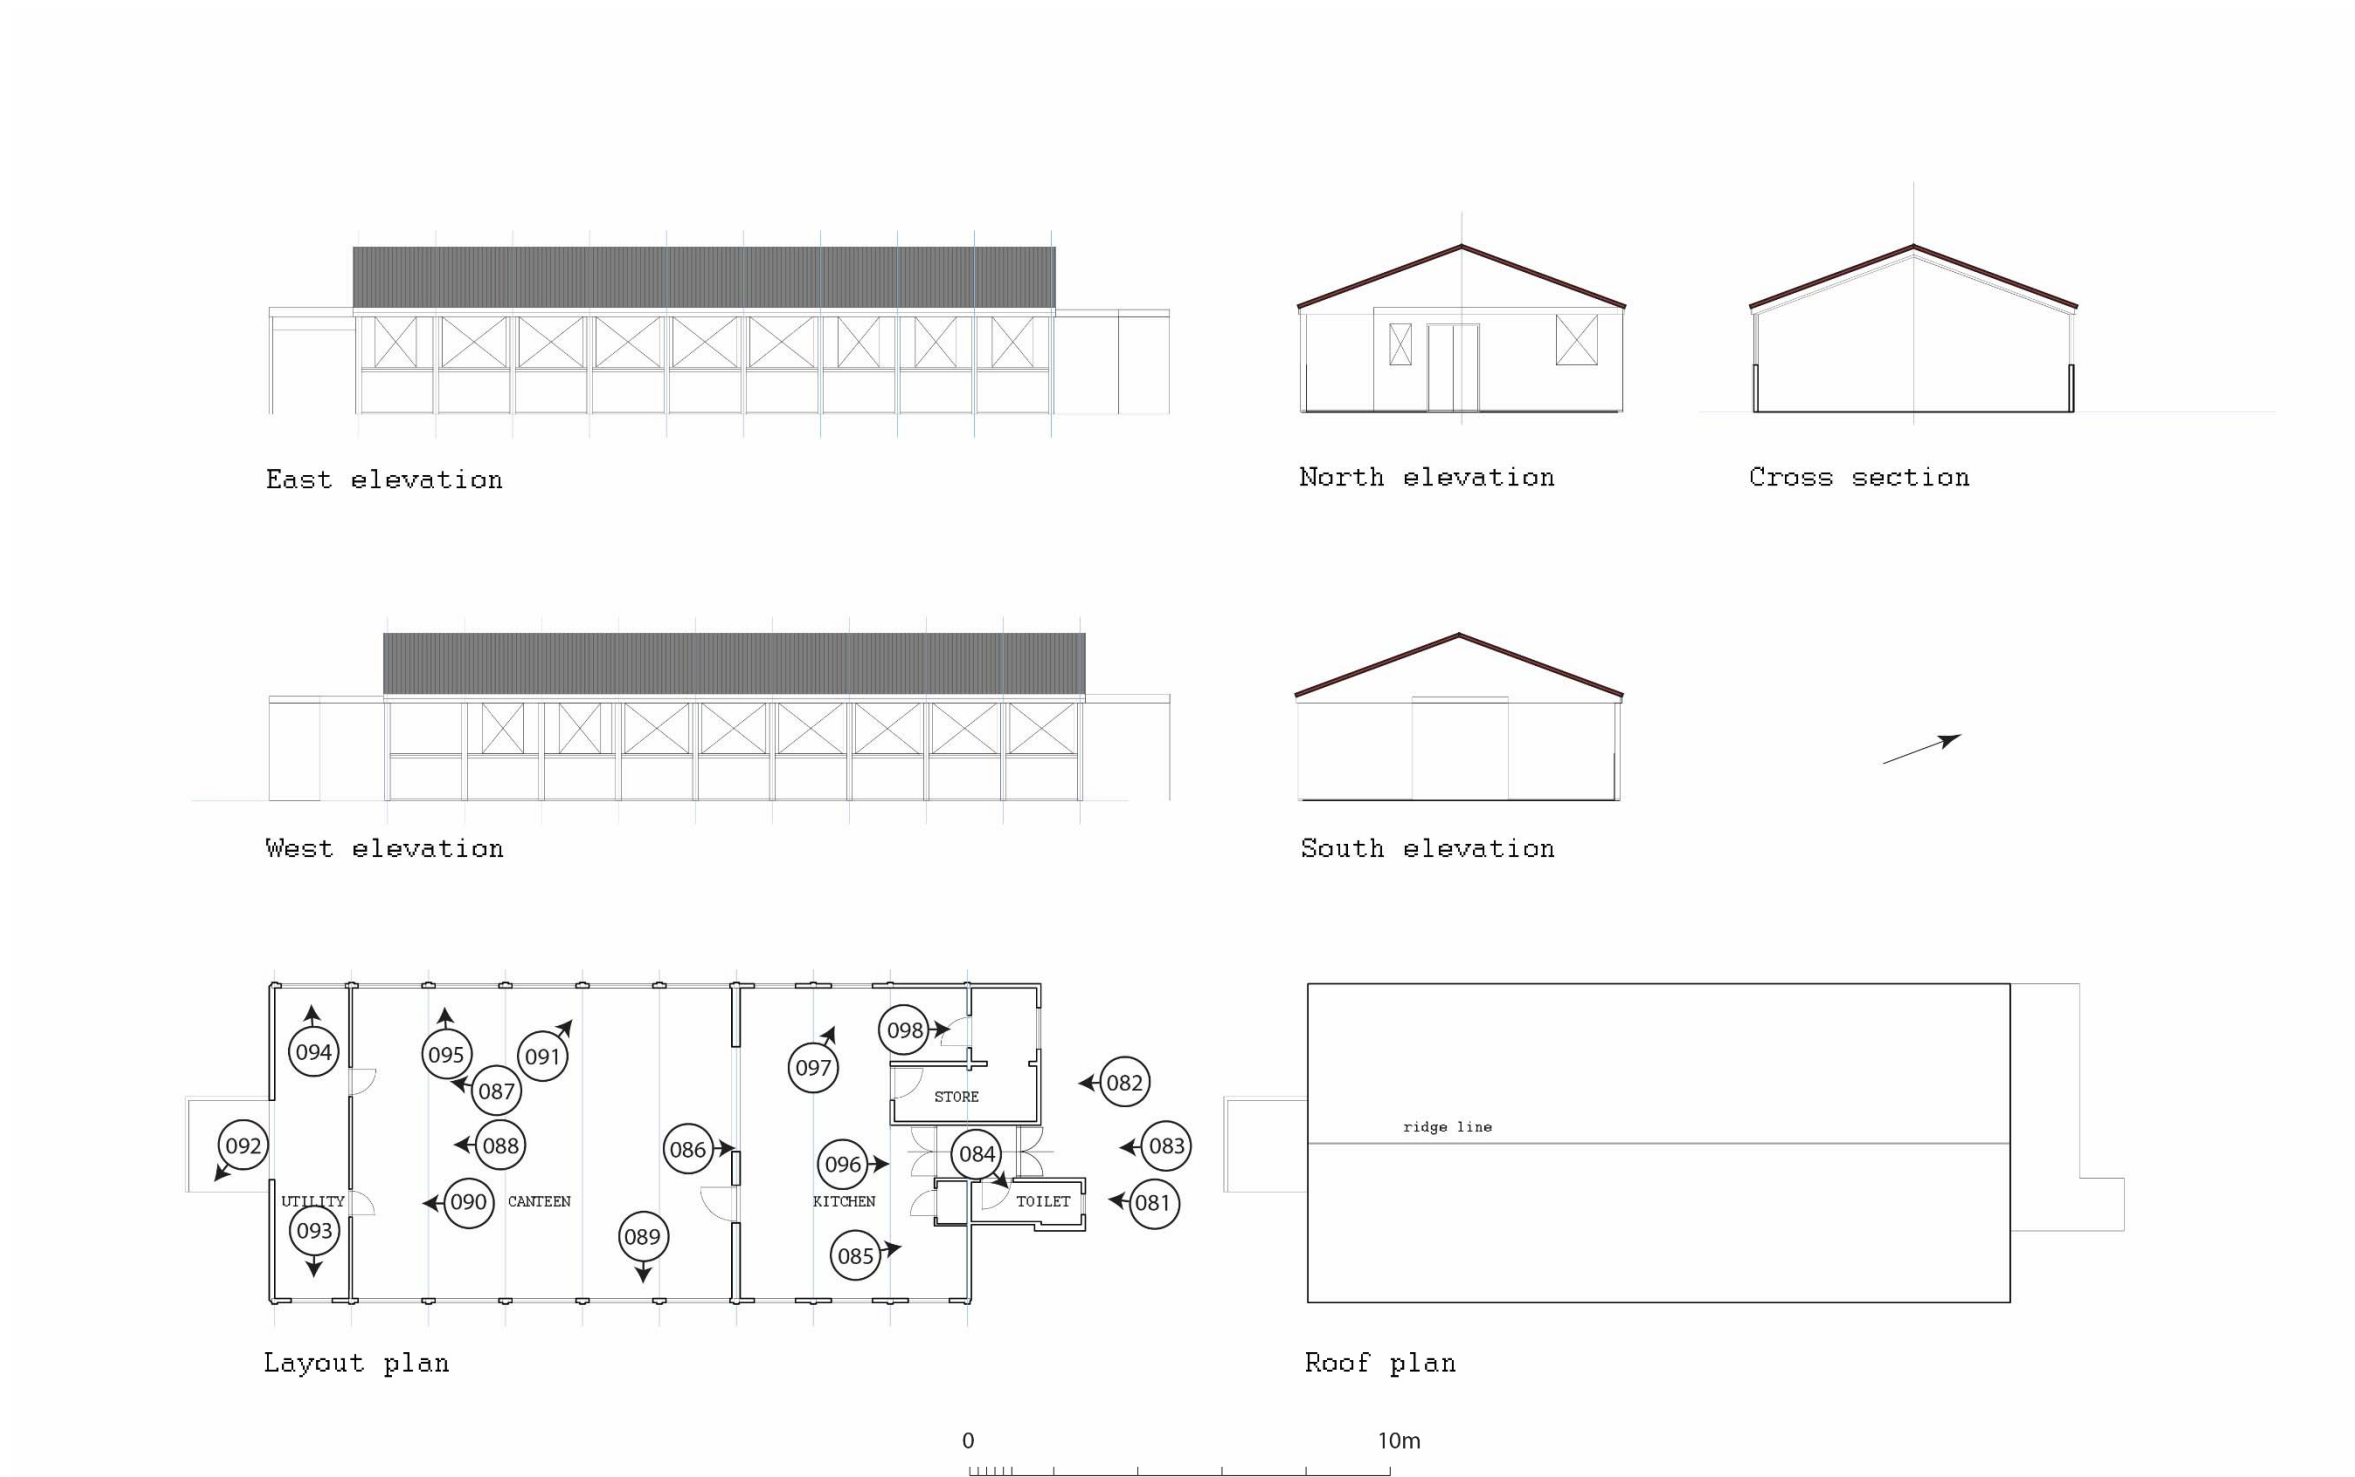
Plans and elevations of the dinner hall/canteen showing photographic locations and orientations (based on architect's plans, courtesy of Glyn Smith)
